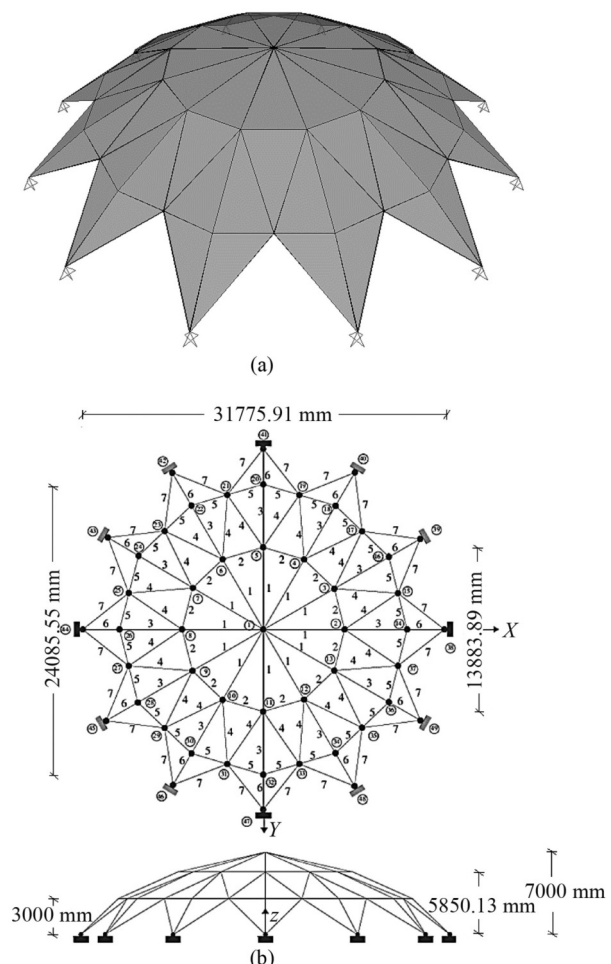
120-bar spatial steel dome structure. (a) 3D view and (b) plan and elevation views.
